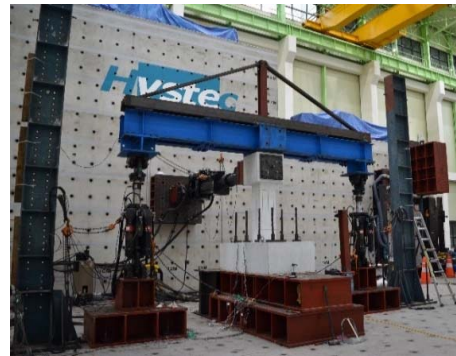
shows a sketch of the experimental test setup of the RC pier test specimen of a 2-span bridge structure for RTHS. It is worth mentioning that the bridge deck and girders are analytically modeled.
